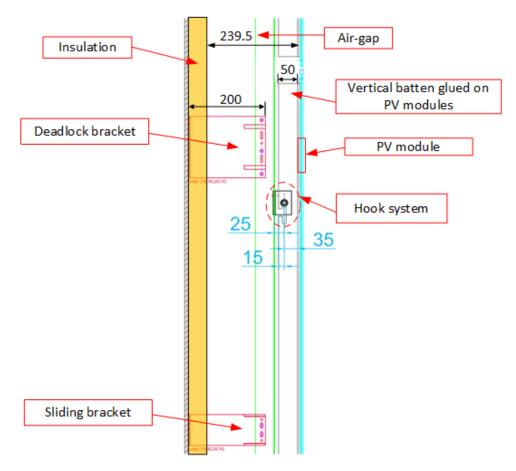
Cross-section of the Brynseng facade, including outer wall, brackets, and PV module, measurements in mm. Explanations from the author, original picture retrieved from [54]
